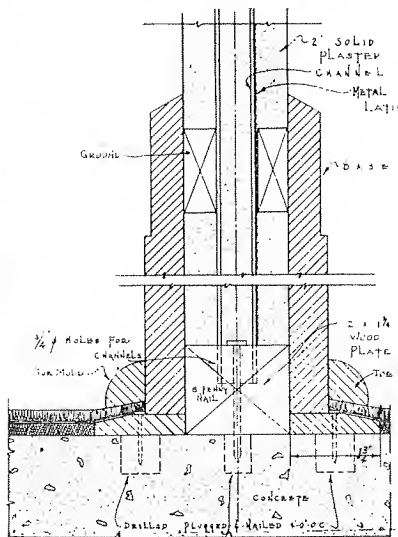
Baseboard and Carpet Strip Detail, Hotel Rienzi, Chicago. (Hooper and Janusch, Arch's.)
